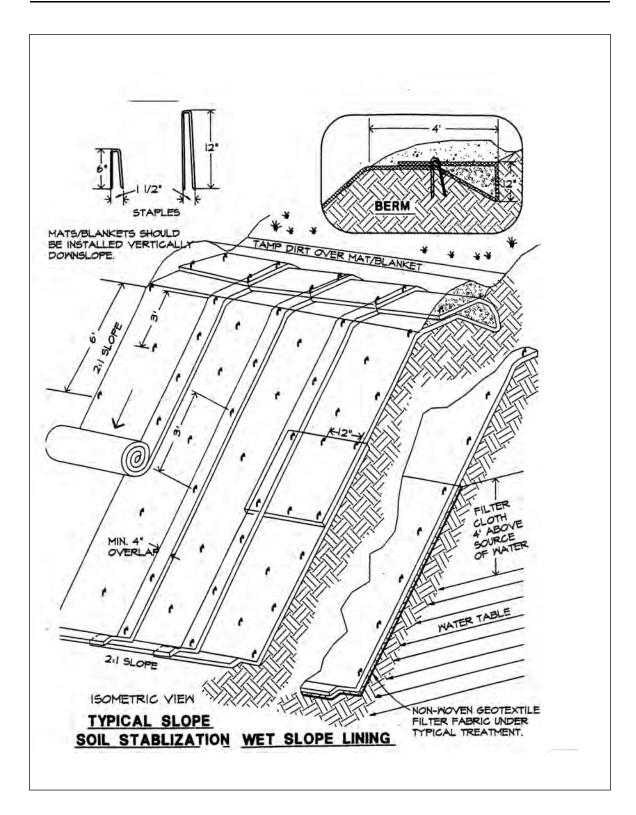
Erosion Blankets and Turf Reinforcement Mats – Slope Installation
